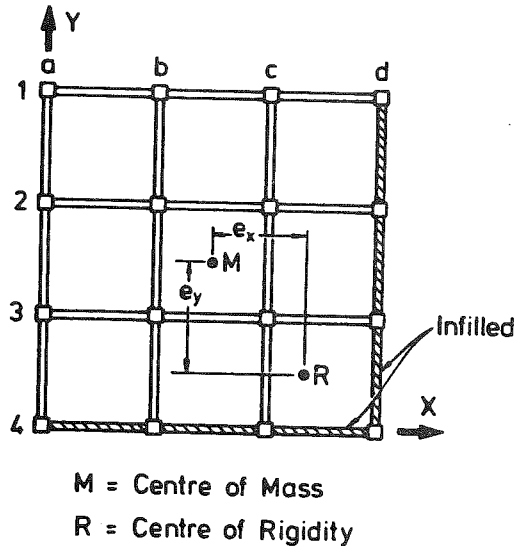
PLAN OF R.C. FRAME BUILDING WITH INFILL ON TWO BOUNDARIES.
